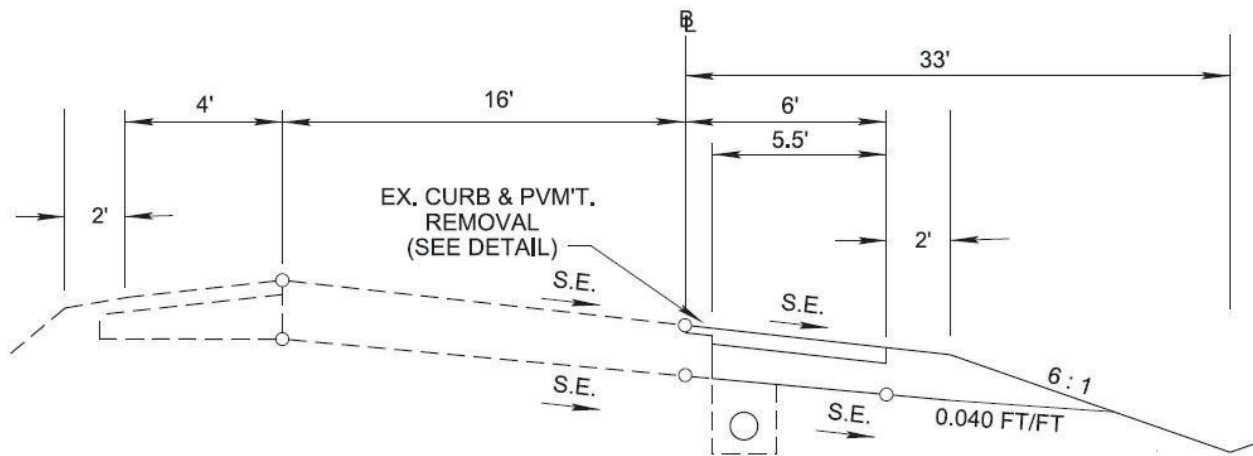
Existing and proposed typical section. From Sheet 2B, Preliminary Plans (3/12/2024).
